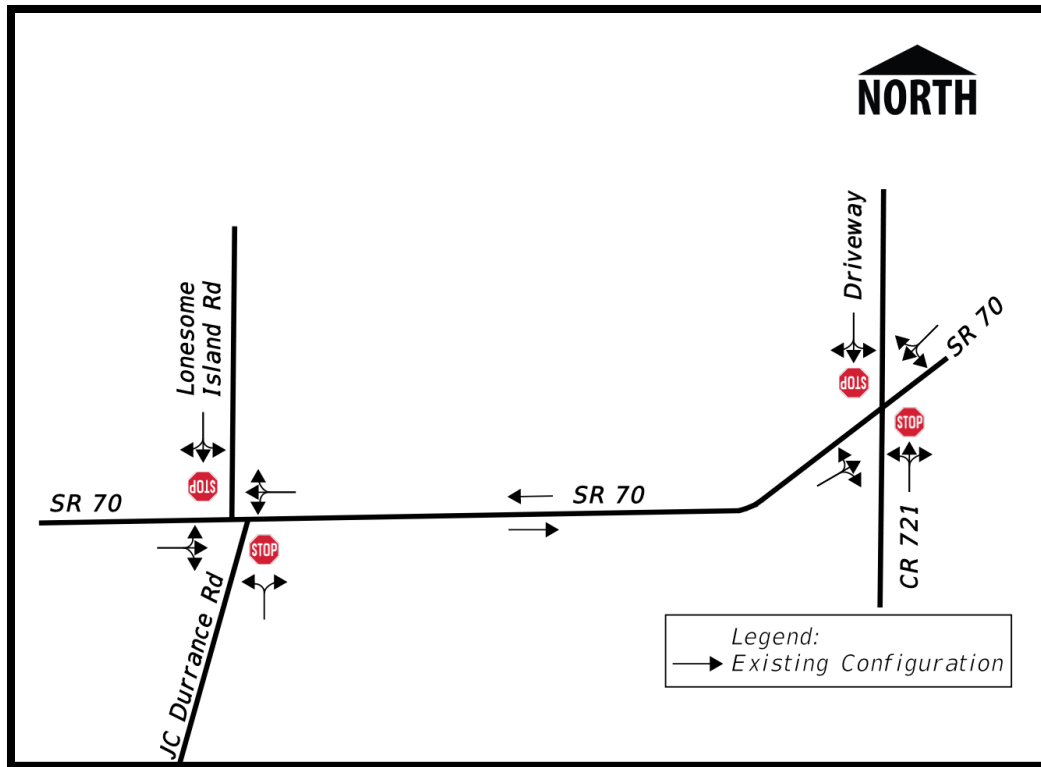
| Existing Conditions – Lonesome Island Road/JC Durrance Road at SR 70
